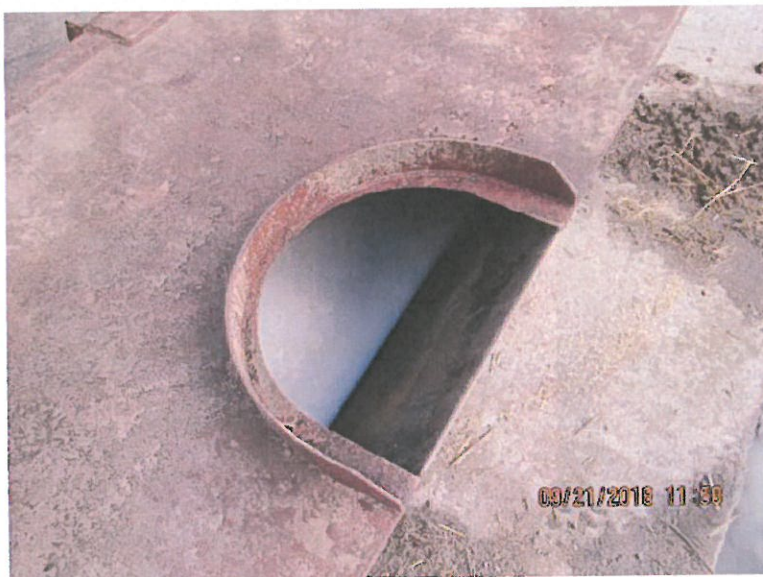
View of the concrete lane south/in front of the calf barn. Photo direction is west.
